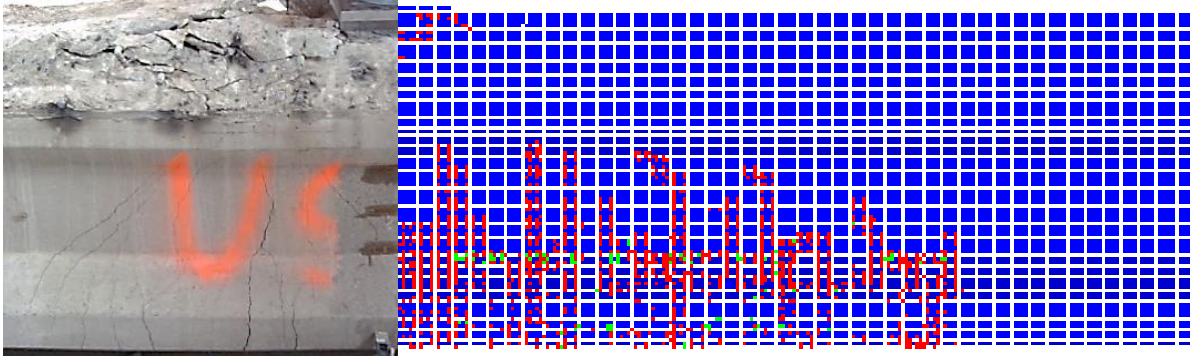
, Shows the cracking scheme of the actual girder (left) to the ANSYS model (right)
